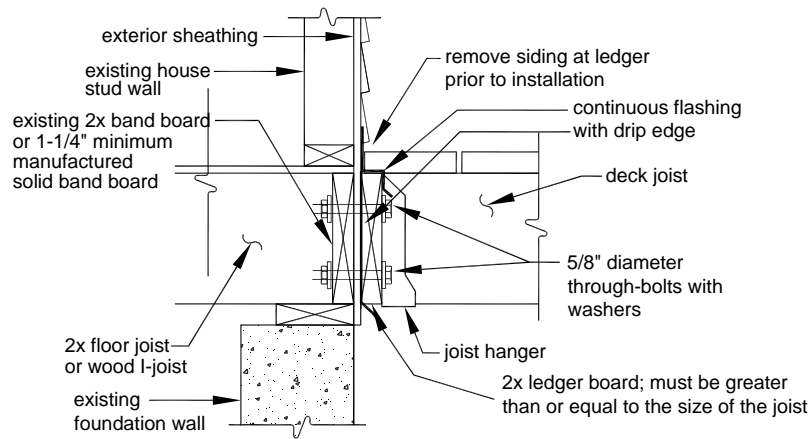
ATTACHMENT OF LEDGER BOARD-TO-BAND BOARD
